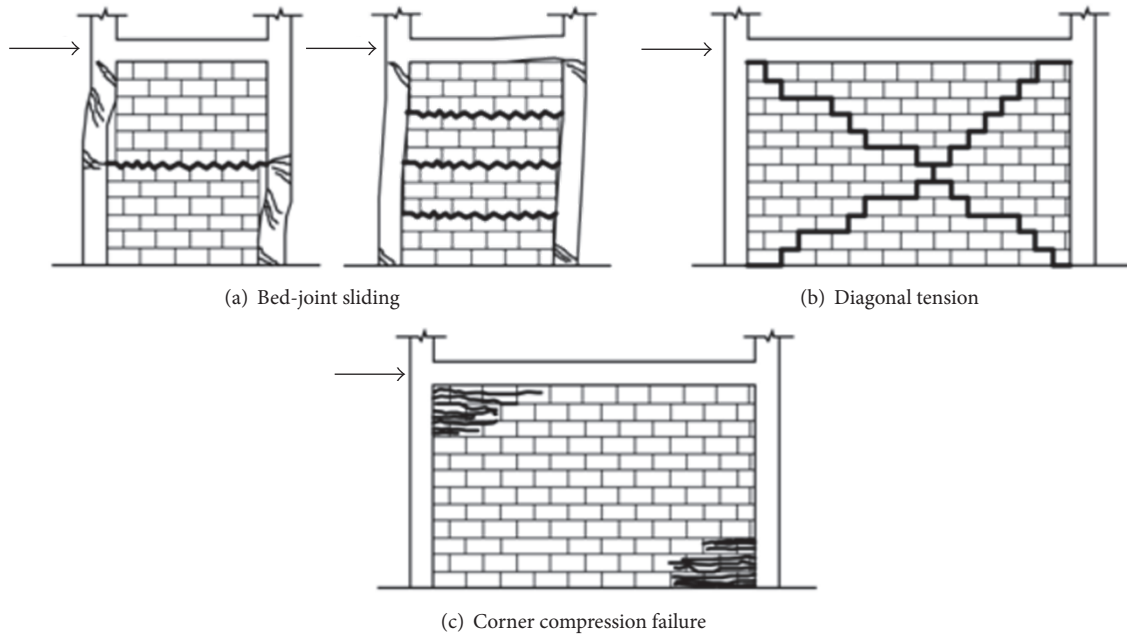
Typical failure modes of masonry infill walls under in-plane loading [15].
